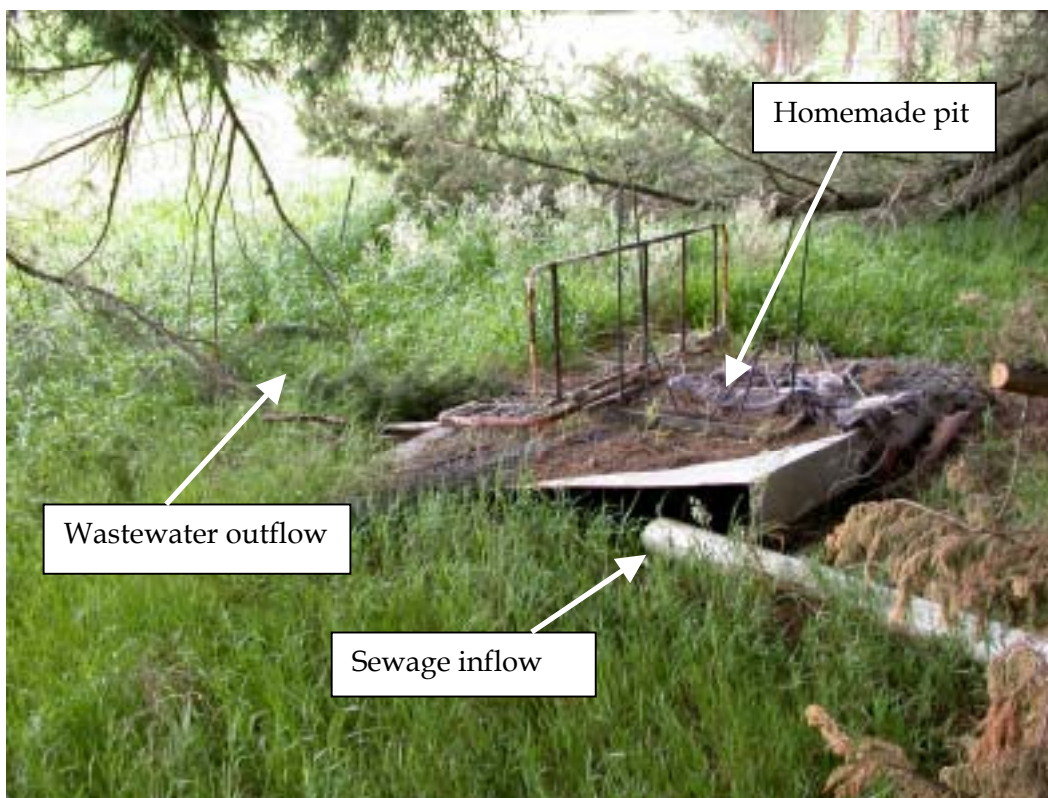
Failing septic tank in the Lenswood Creek sub-catchment
